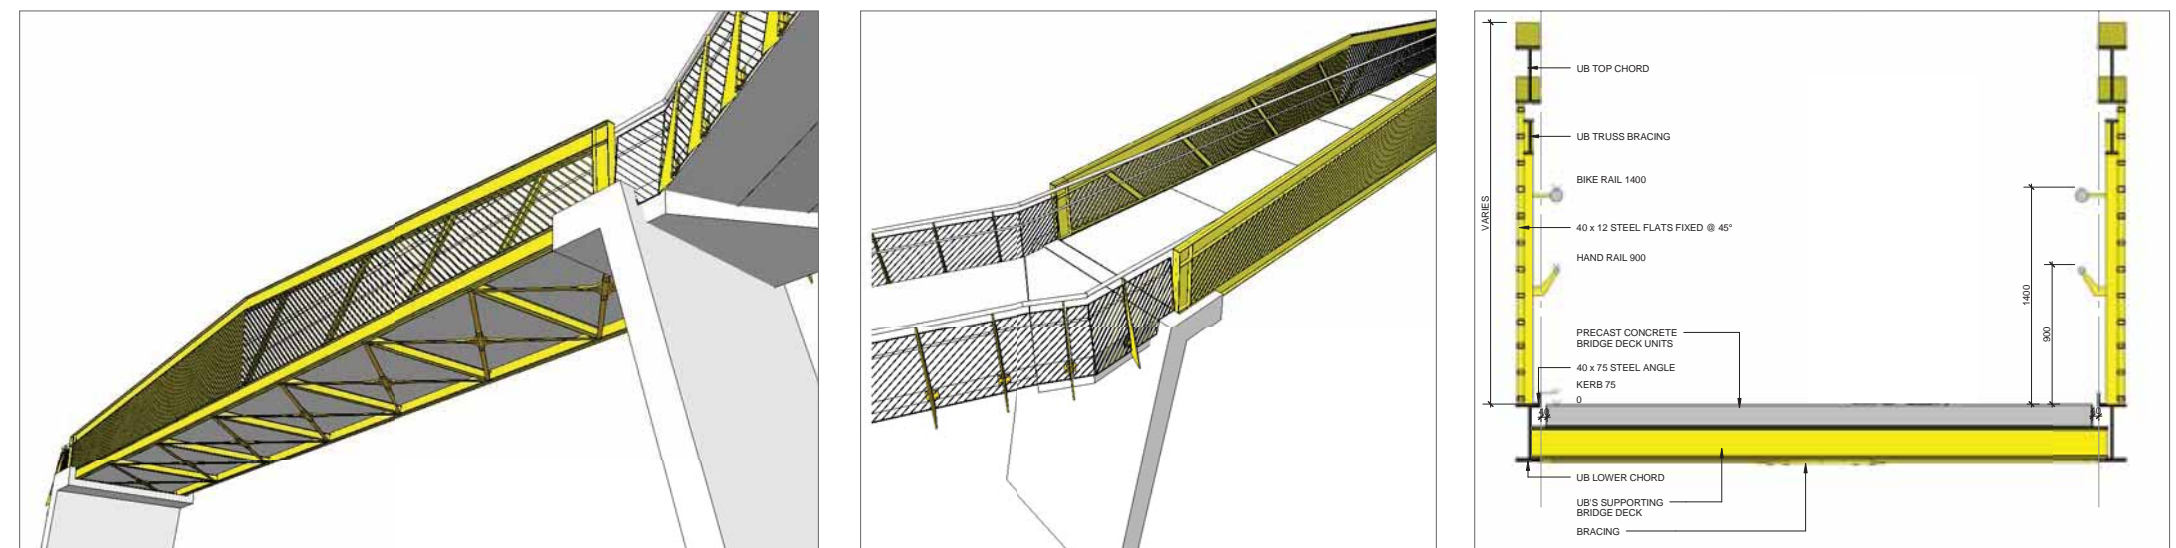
New bridge arrangement over Patiki Road on-ramp
